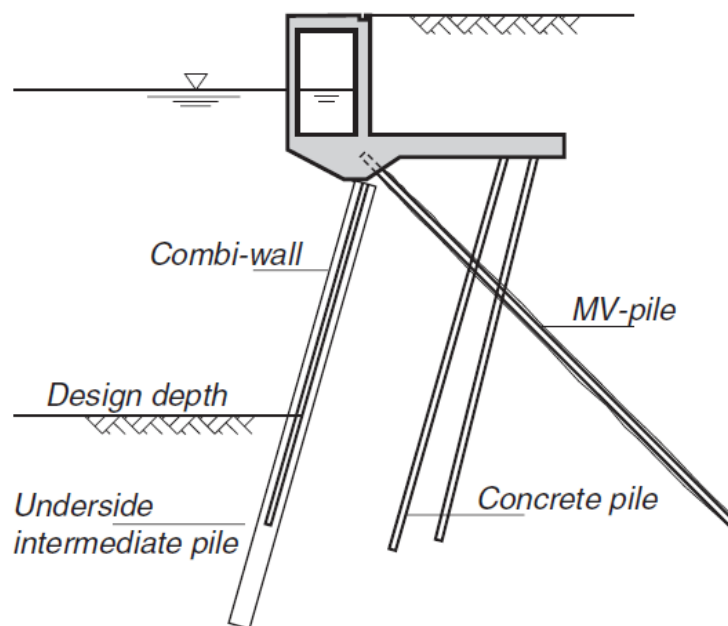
Quay wall with relieving platform. Source: CUR211 (2013)
